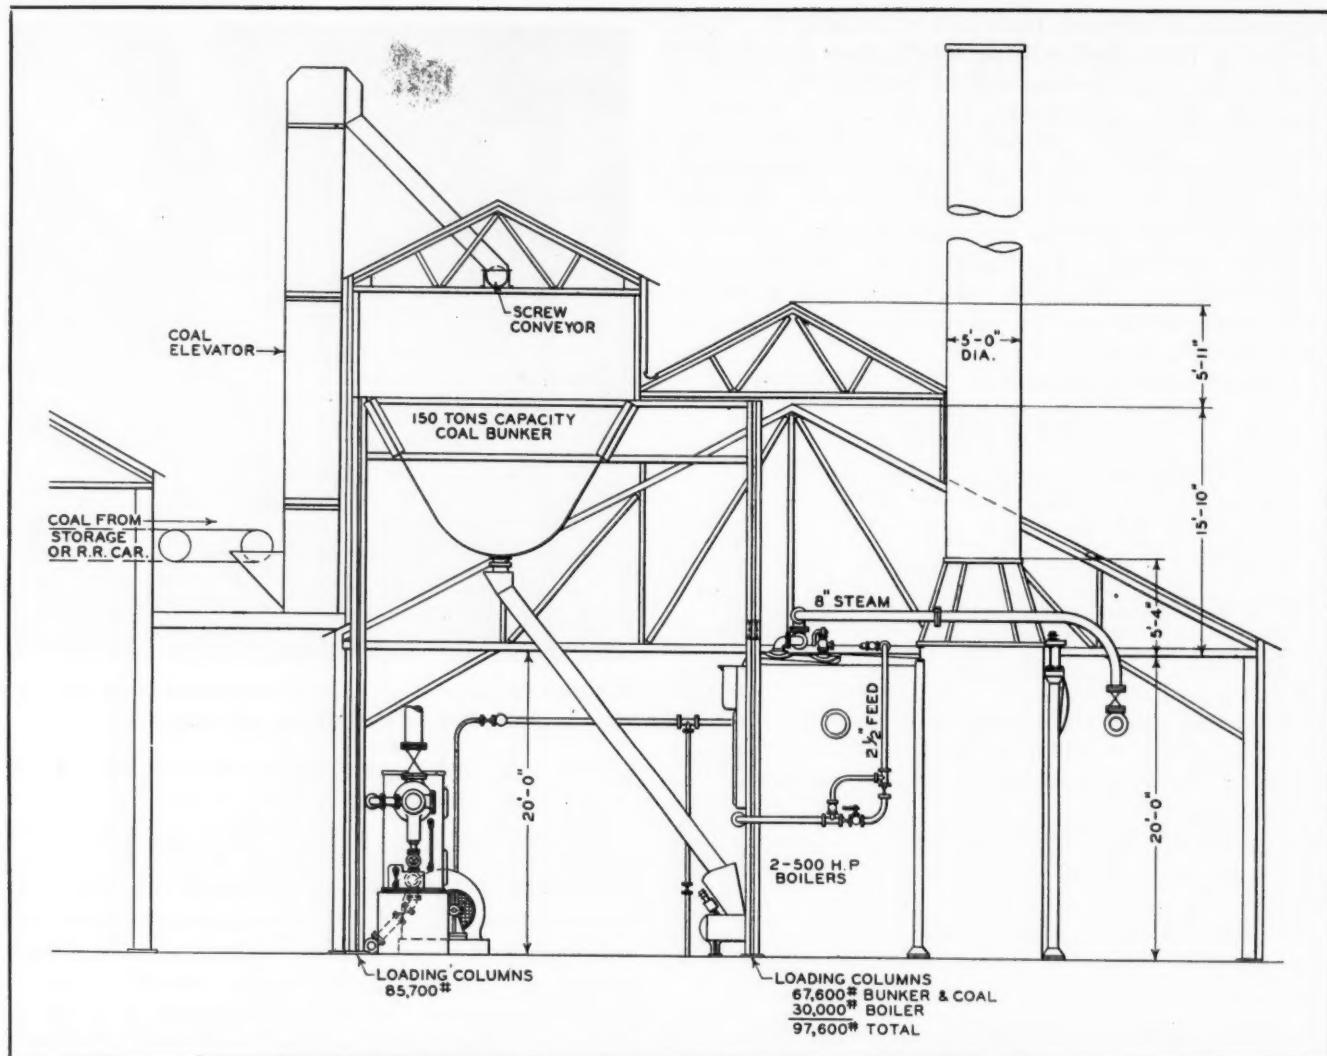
General arrangement plant—Pittsburgh Spring & Steel Company
